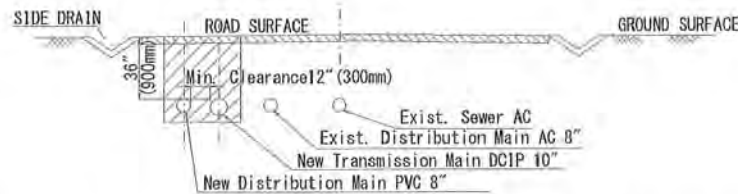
Typical Section of Additional Water Transmission Main-3 (PVA intersection - Minatobashi Bridge)
